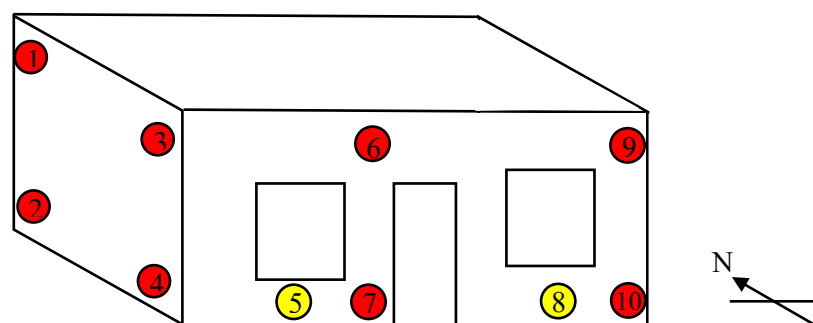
Monitoring locations inside the south facing walls and the west gable end wall.
